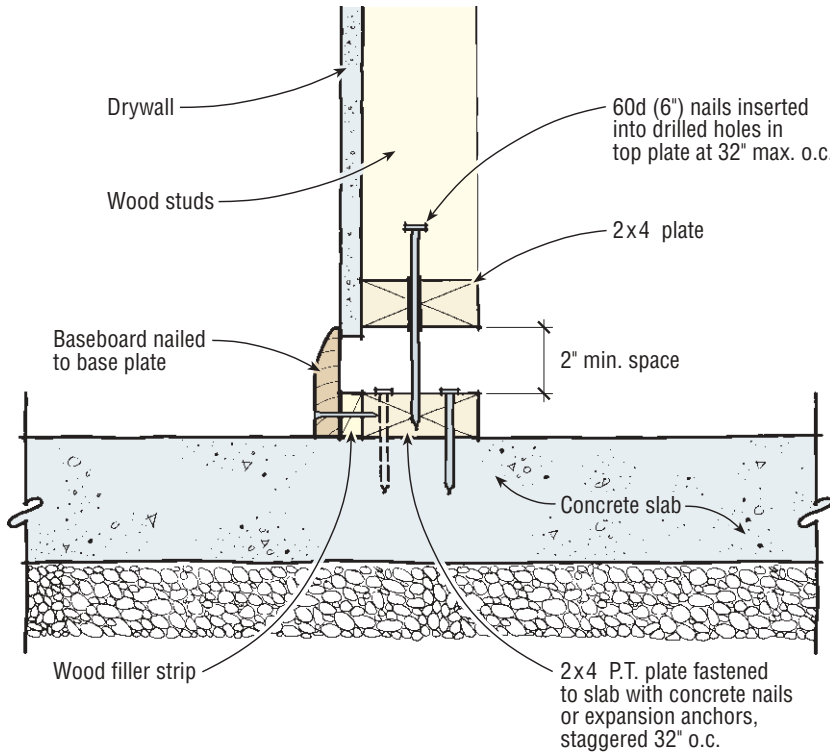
Where basement slabs are used in expansive-soil areas, a “floating wall” detail is used to prevent possible heaving from displacing the floor above. A pressure-treated sill plate is powder-fastened to the slab. The partition wall, which is constructed 2 inches shorter than the height of the basement, is temporarily positioned with wedges between the treated sill plate and the bottom plate of the wall. After the top plate has been nailed to the overhead joists, a 60d spike is driven into a slightly undersized predrilled hole in the bottom plate of the partition and into the treated sill plate. The baseboard is nailed to the sill plate but not the wall itself, so any movement of the slab will not distort the partition.
